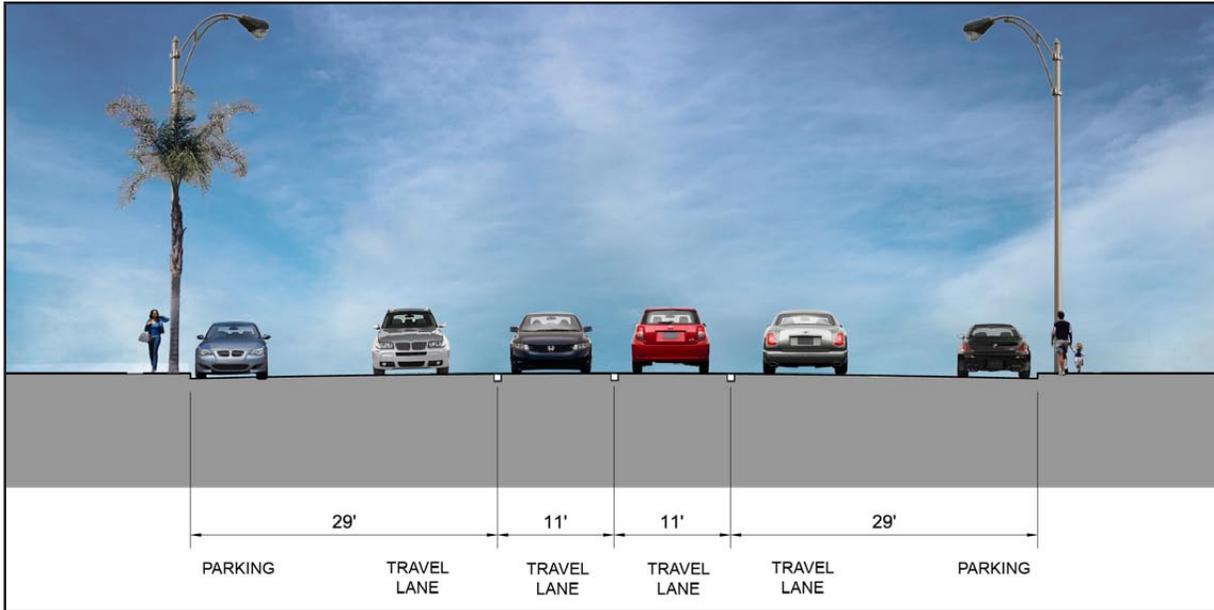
Peck Road, facing south, north of Durfee/Peck intersection — Existing.
